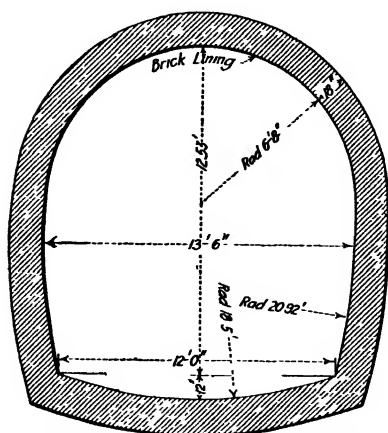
New Croton aqueduct. Standard type above Jerome Park reservoir.
